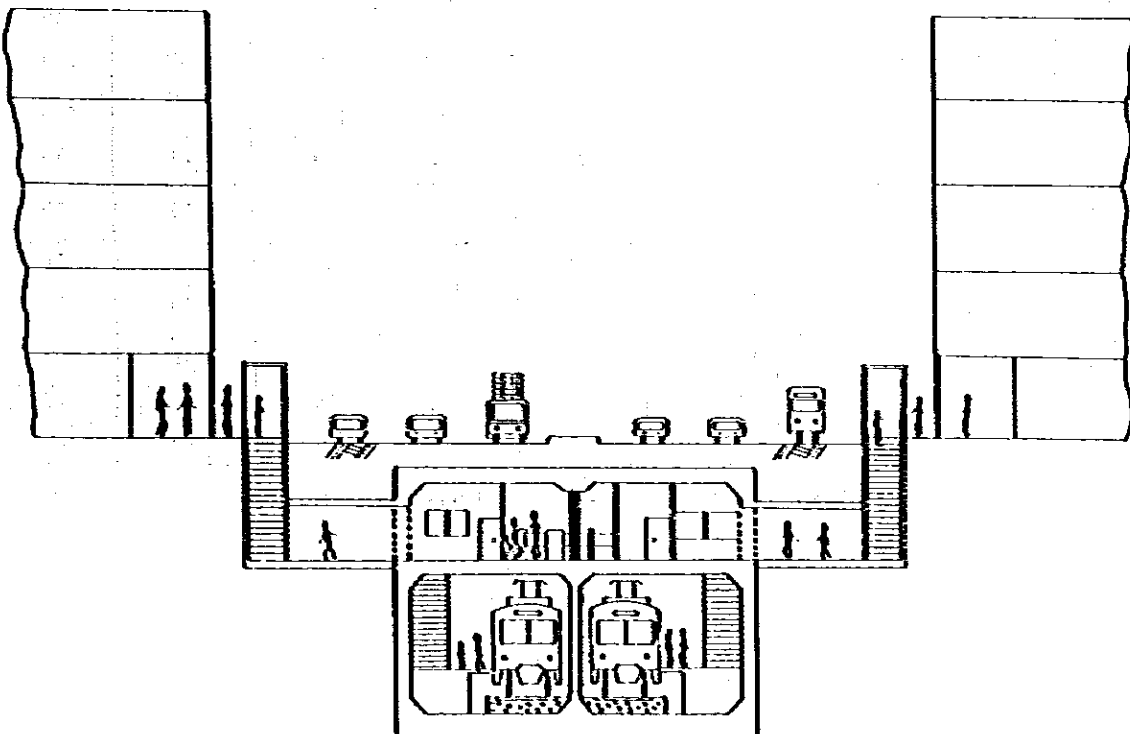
TYPICAL CROSS SECTION (Subway)
